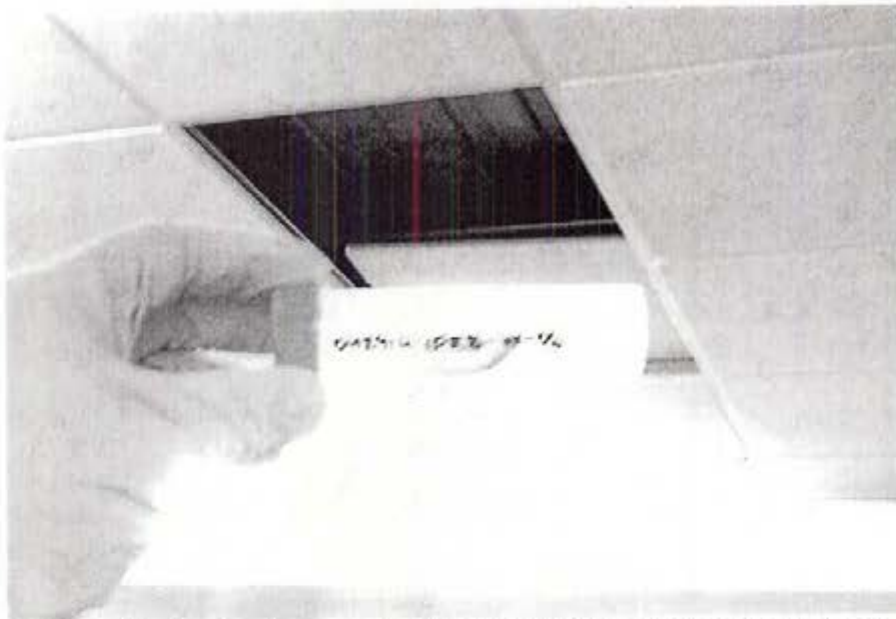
Lead wipe sample (042914-IFRB-W-06) collected from old wood paneling above the drop ceiling; further west of hallway.
